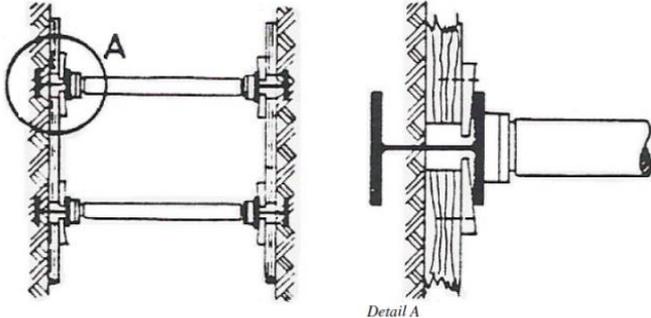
Wedges (Wylaers M., 2016, *Bouwtechniek 1 – Berlin walls*)
